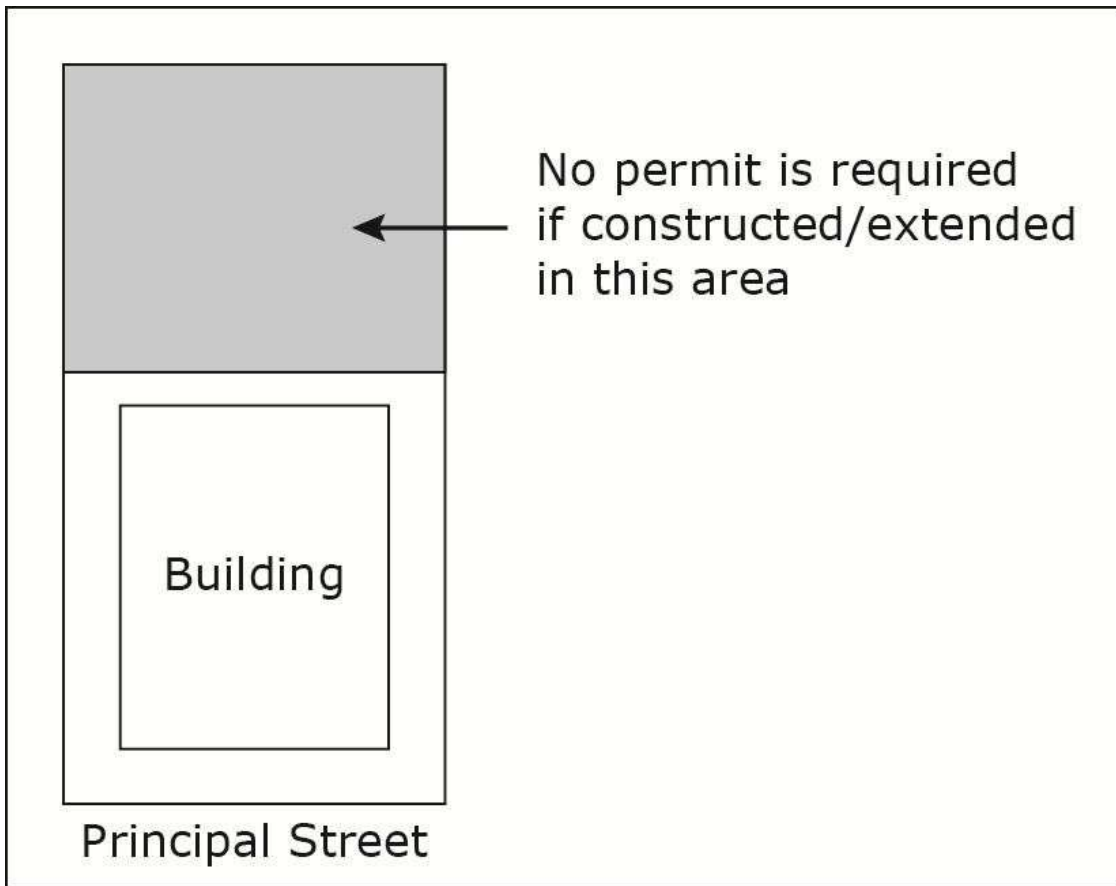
Construction/extension of outbuilding to a not contributory property (not located on a corner site).
